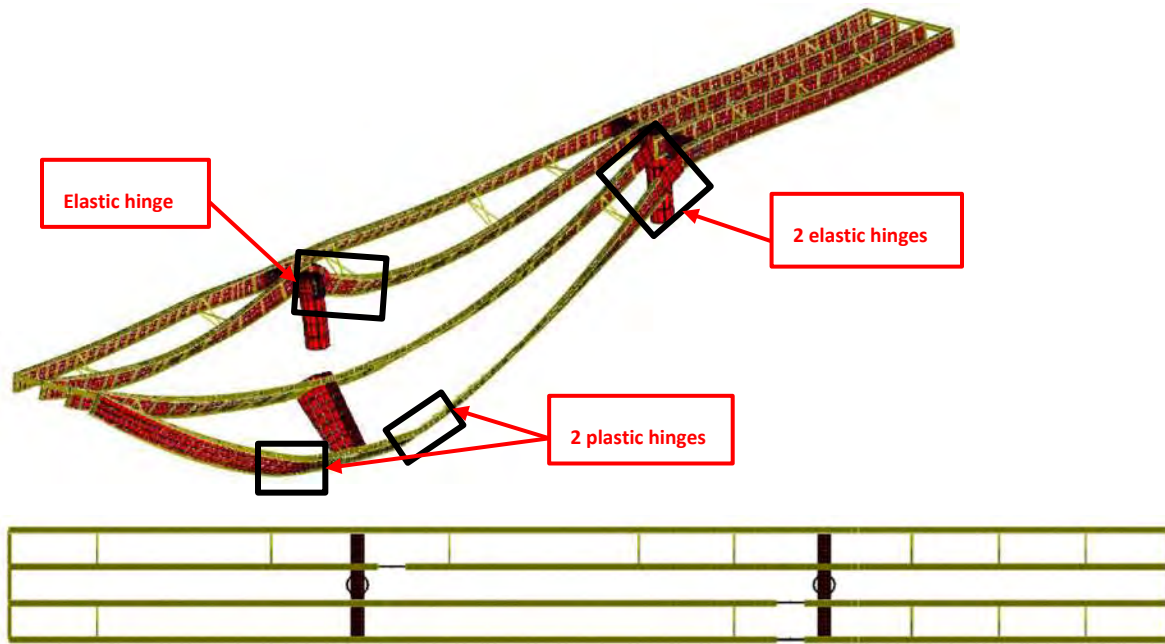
Framing Plan After Hinges are Placed at 1.01xHL93 (Deck not shown for clarity)
